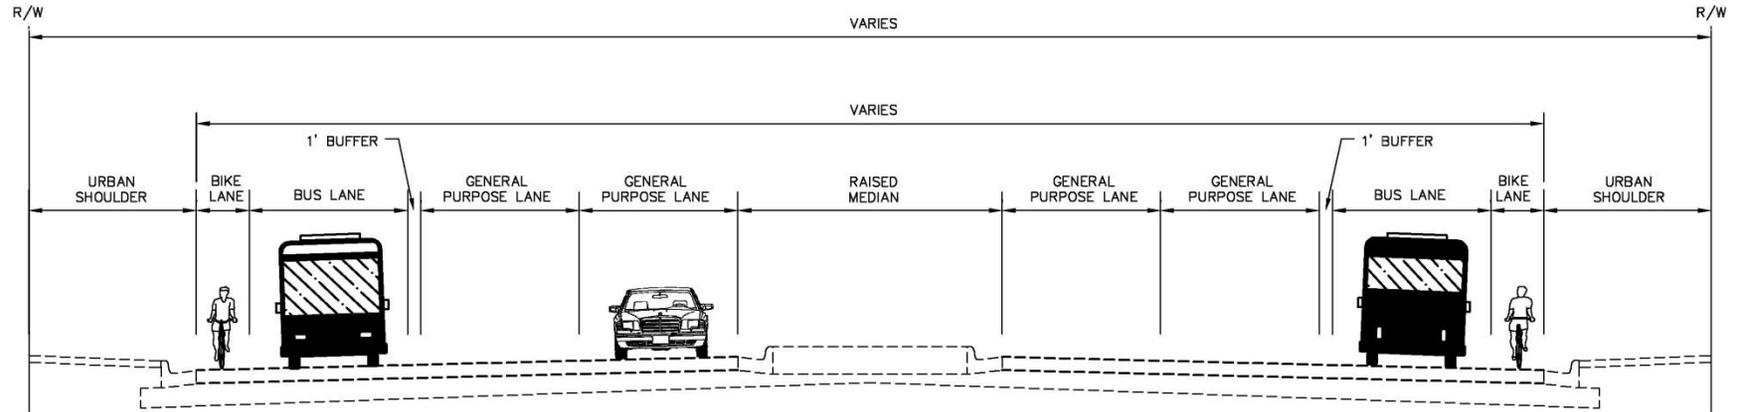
Existing Typical Section on Akers Mill Road
